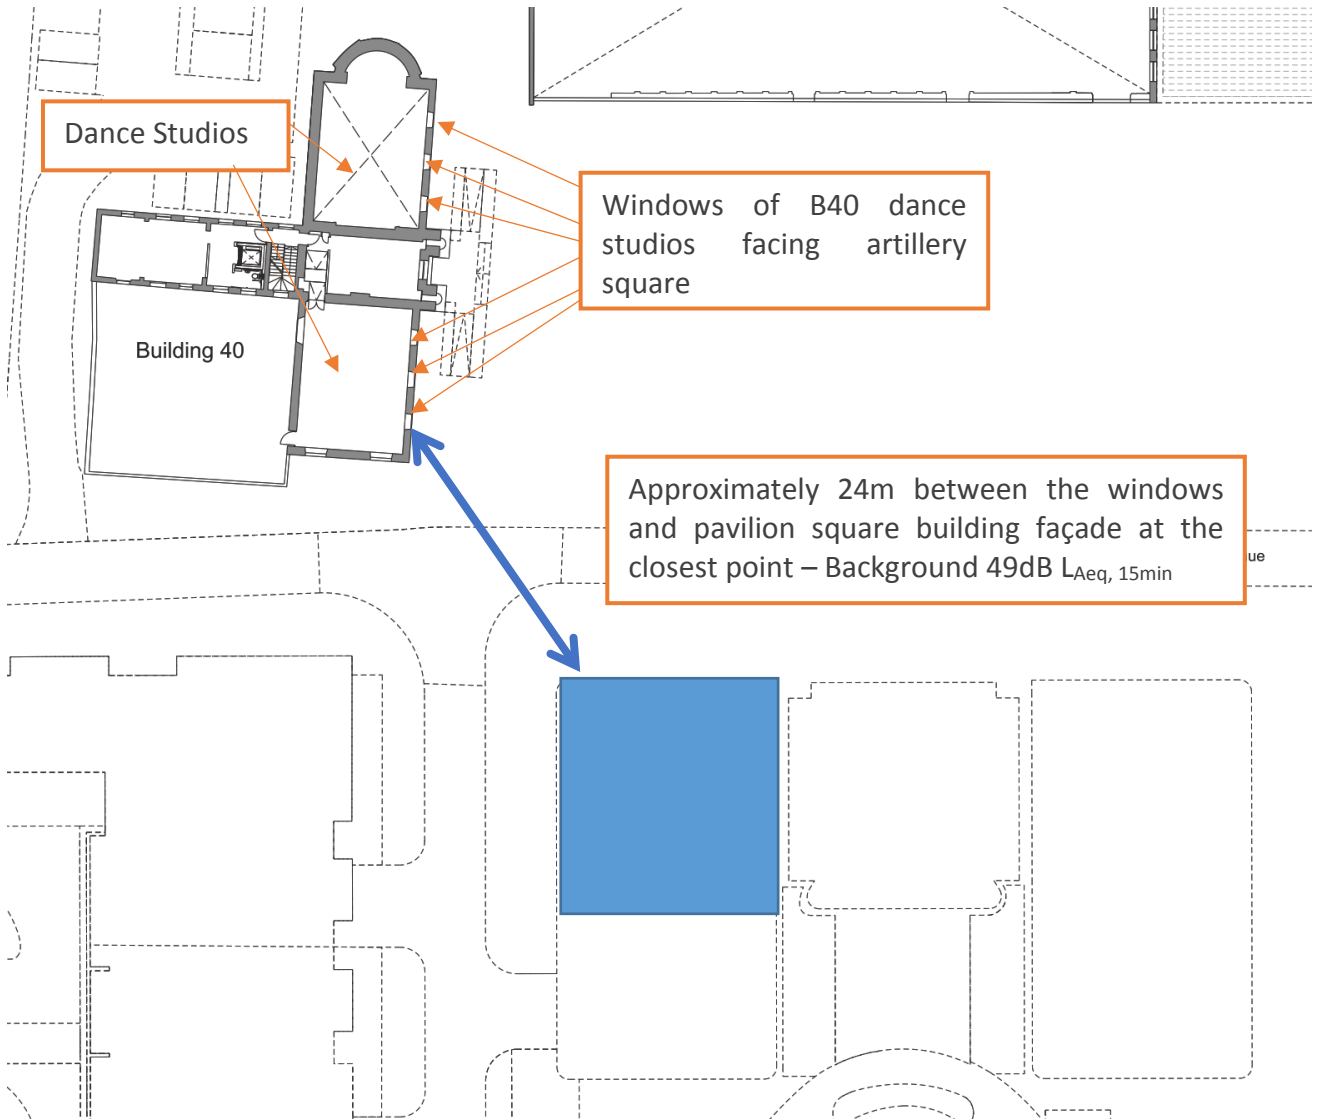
SITE PLAN SHOWING CLOSEST RECEPTORS
